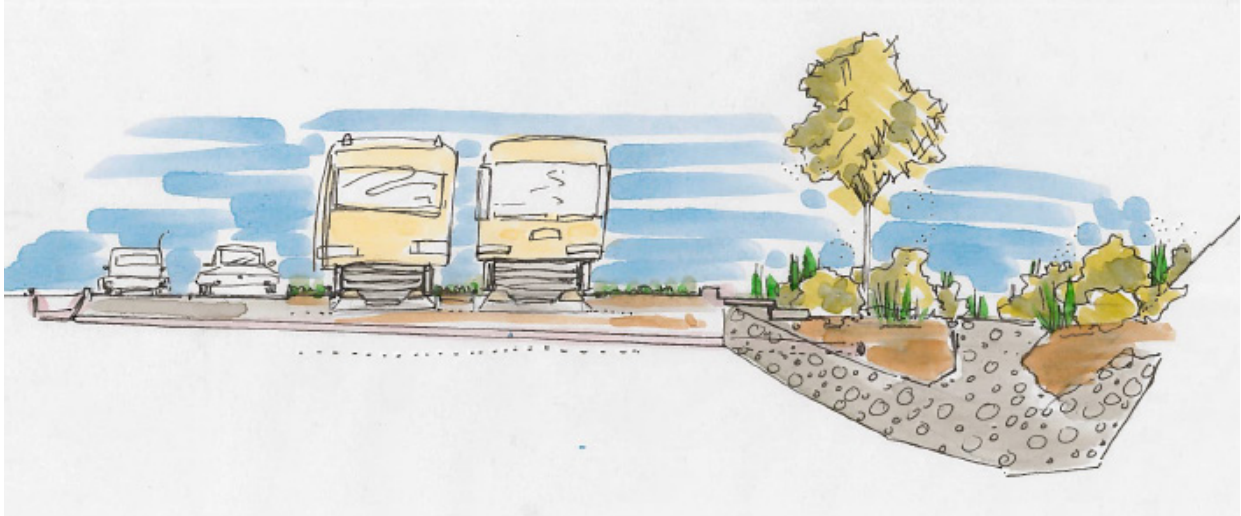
Section cut of roadway with adjacent basin for stormwater collection from road.
